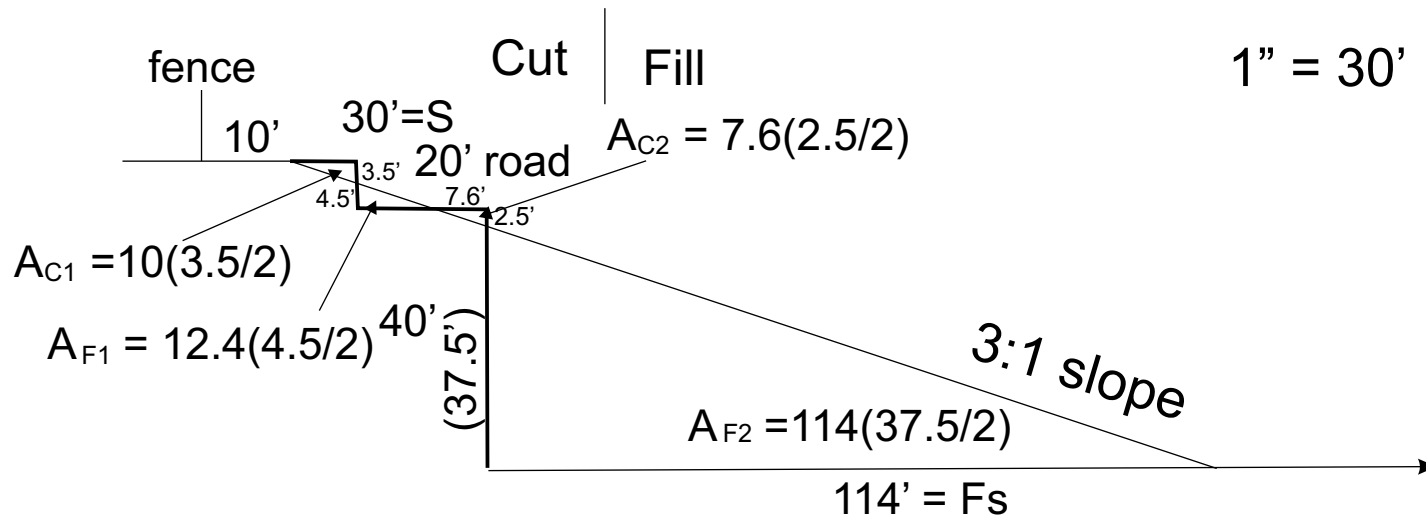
West Sidewall - Condition 2 with $S=30'$ and 20' road corridor; barrier=fence
